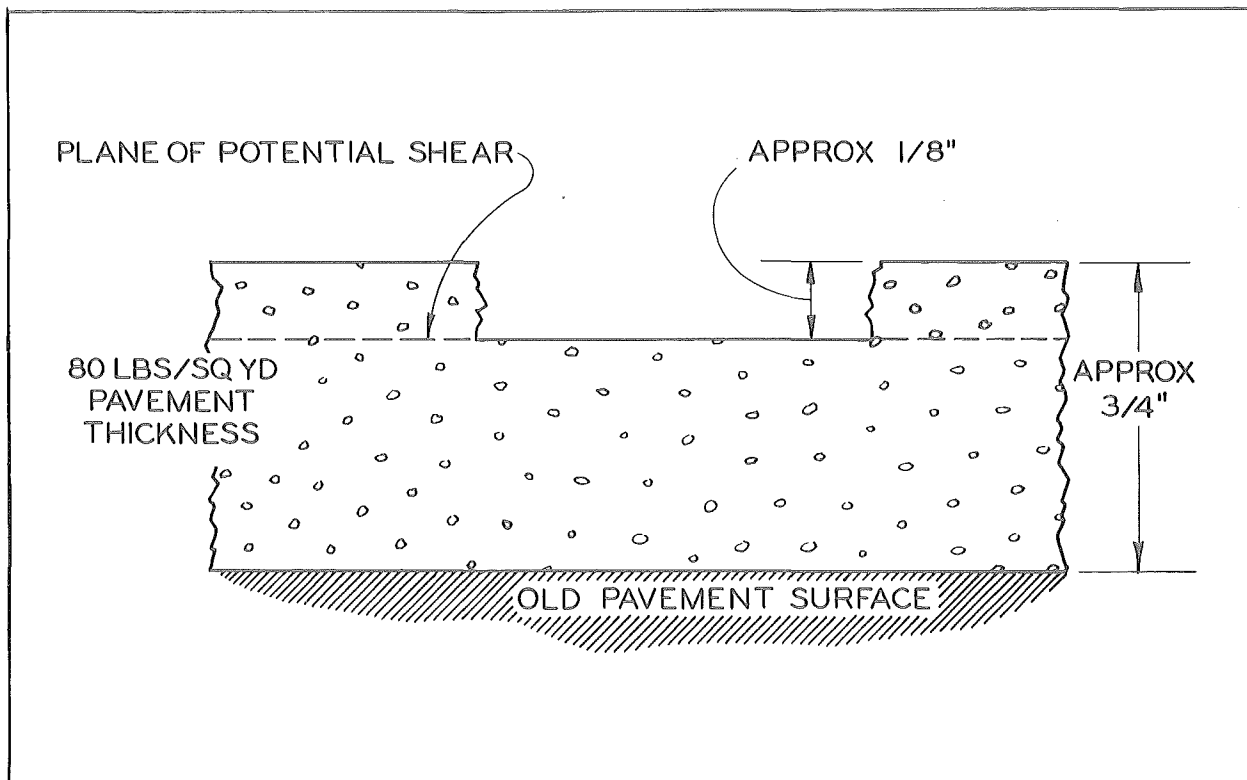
Cross-section of sand-asphalt surface showing delamination.
